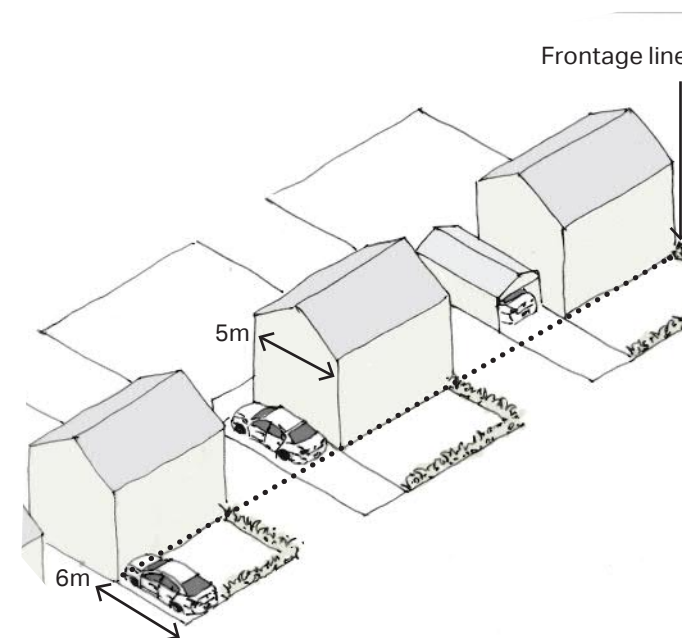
Appropriate parking solutions - On-plot parking provided to the front and side of a dwelling as well as in a parking garage.
